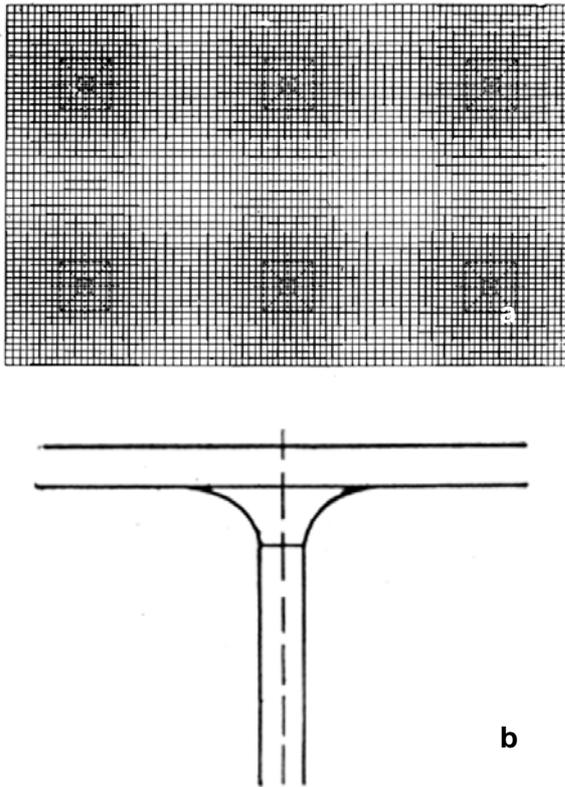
Maillart's flat slab with (a) two-way arrangement of reinforcing steel and (b) mushroom column head with smooth transition between the slab and column, 1907. (Bill)
